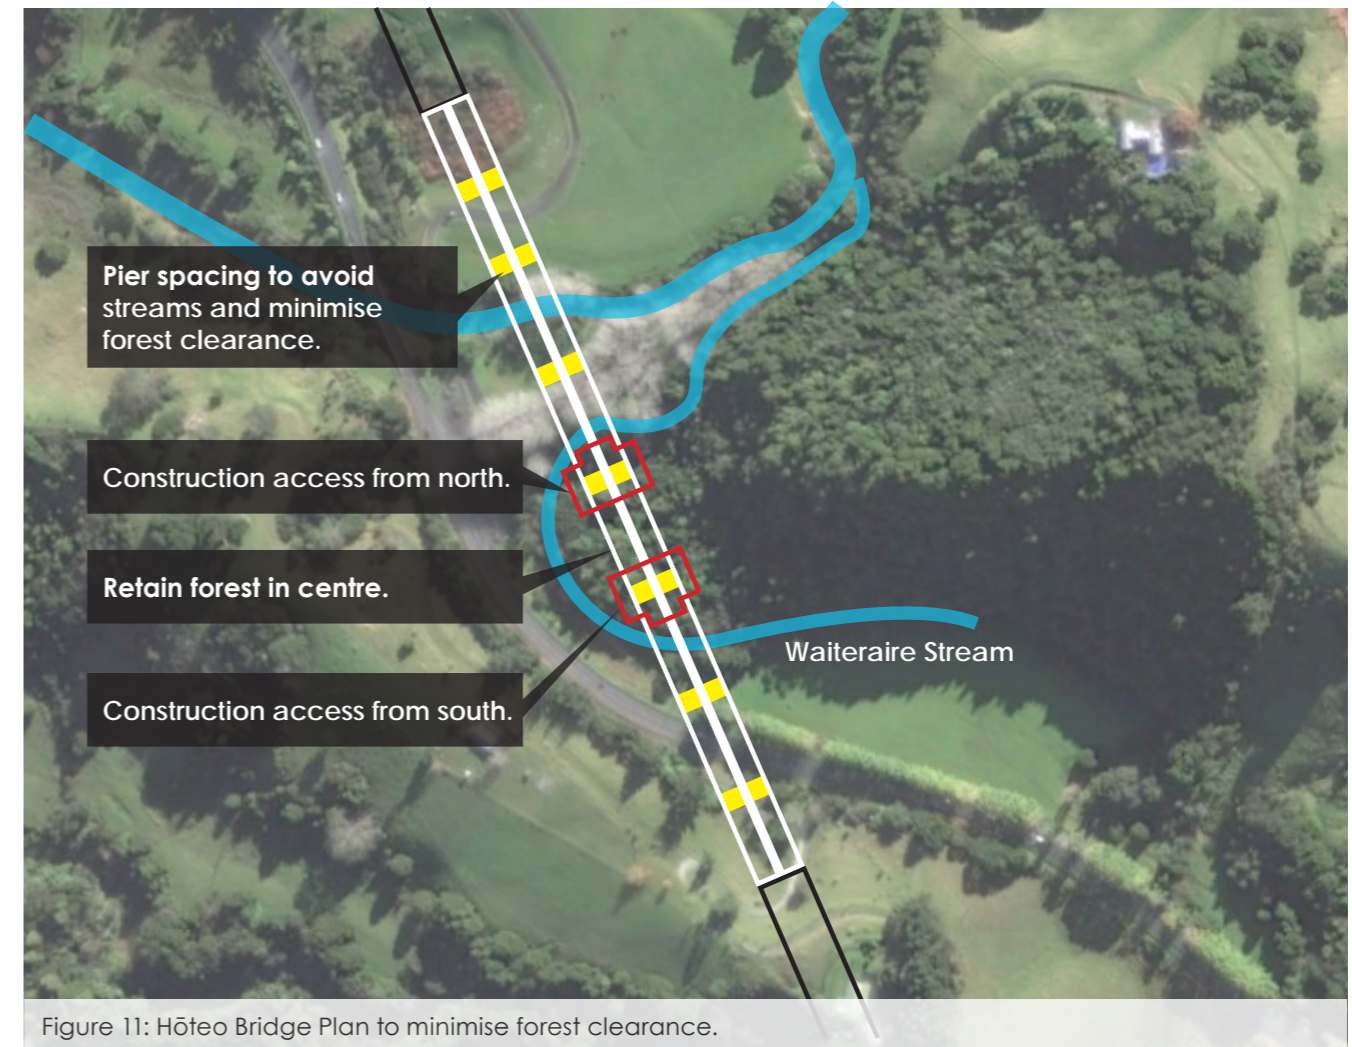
Hōteio Bridge Plan to minimise forest clearance.
